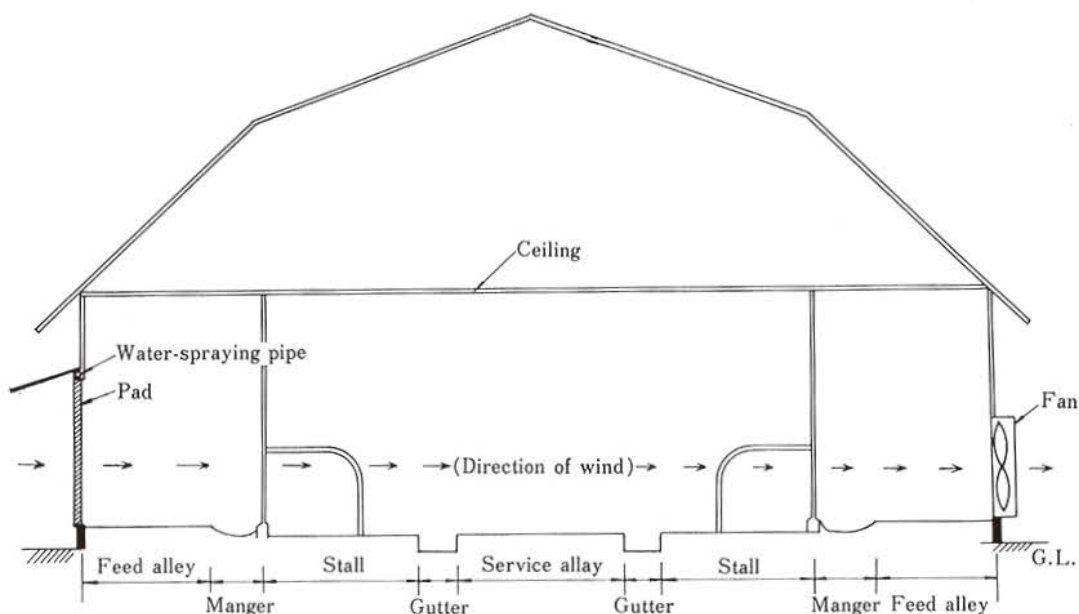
Sectional plan of dairy cow shed with ventilation device
